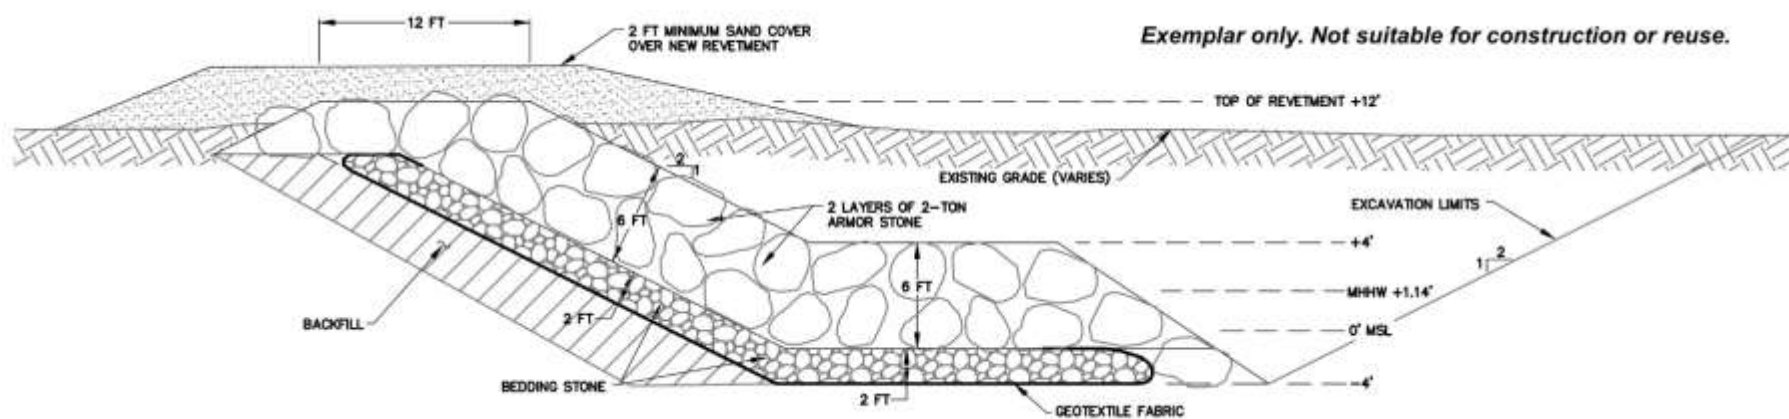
Sample cross-section of buried revetment and dune restoration (Boudreau et al. 2018).
